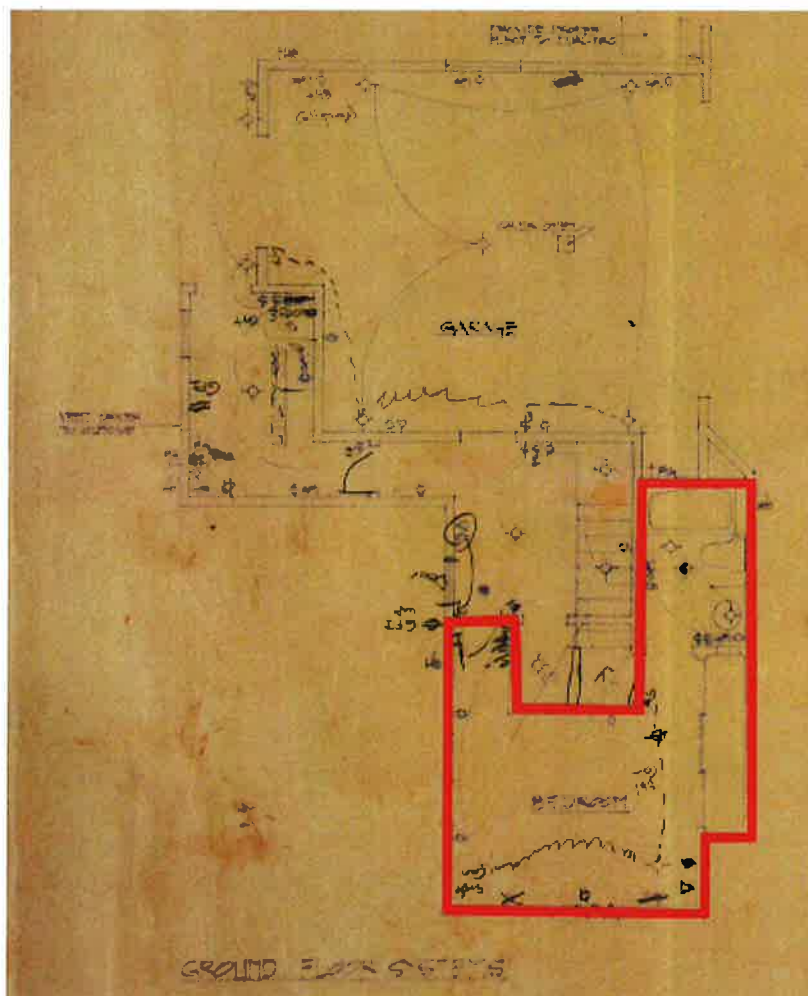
Ground Floor Plans (Rental Area Outlined)
